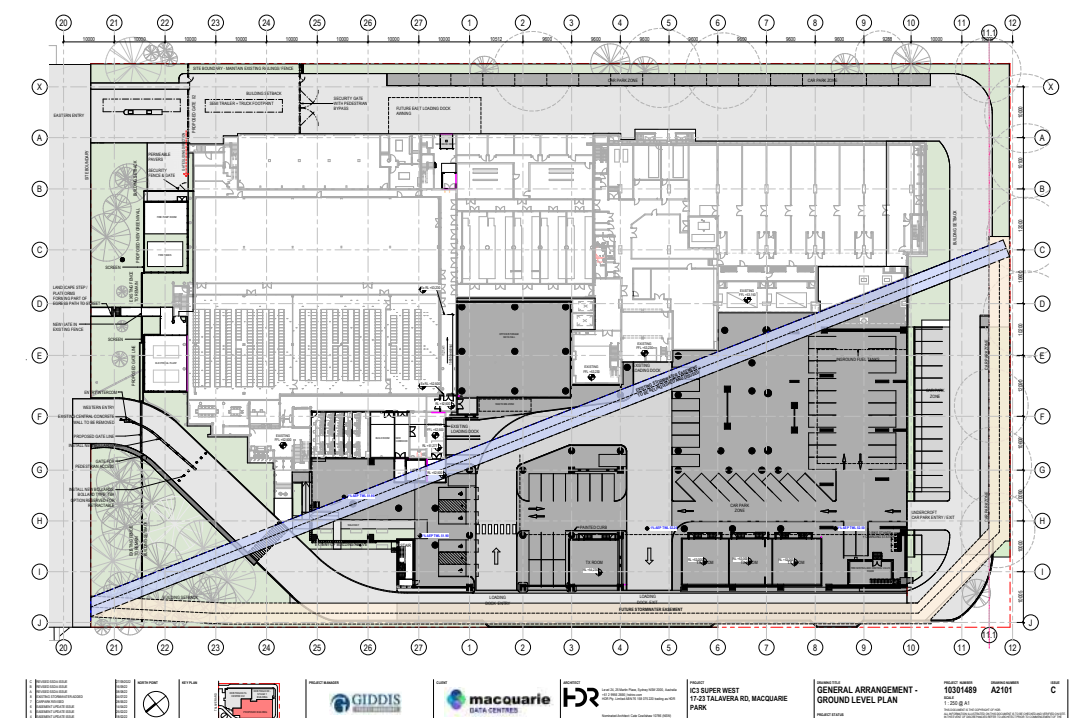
Proposed SSD IC3W - General Arrangement Ground Floor (Source: HDR)
